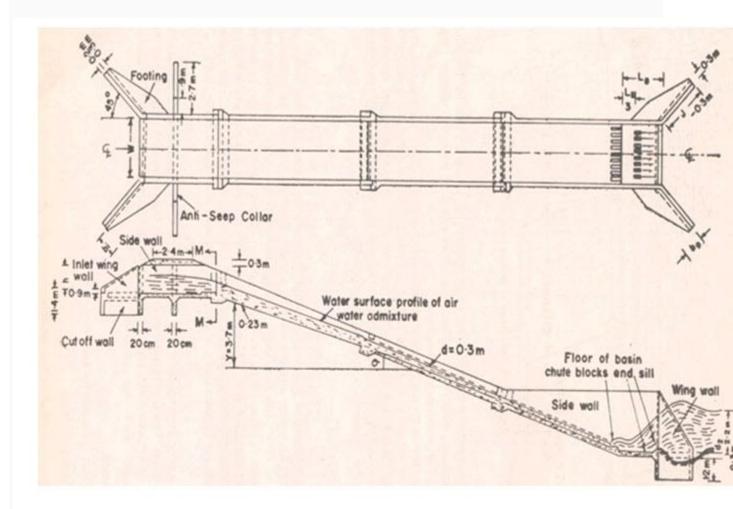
Structural details of a chute spillway. (Source: Singh et al. 1990)
